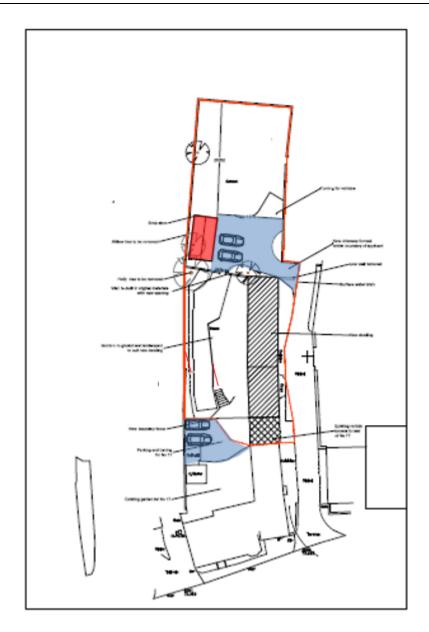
Overall site plan showing proposed area for strip, map and sample (outlined in red) and for watching brief (outlined in blue). NB the client revised plans for the garage (red area) to erect a timber built stable on a concrete raft instead so this area was included in the area for the watching brief as it would no longer be requiring foundations. Plan provided by client.
